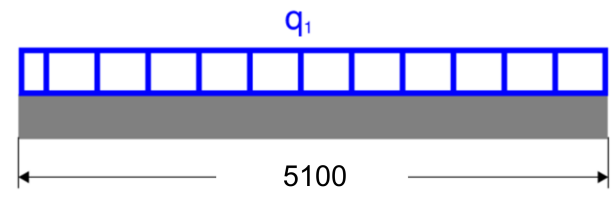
Design load on the facade beam with a length of 5.1 meters
